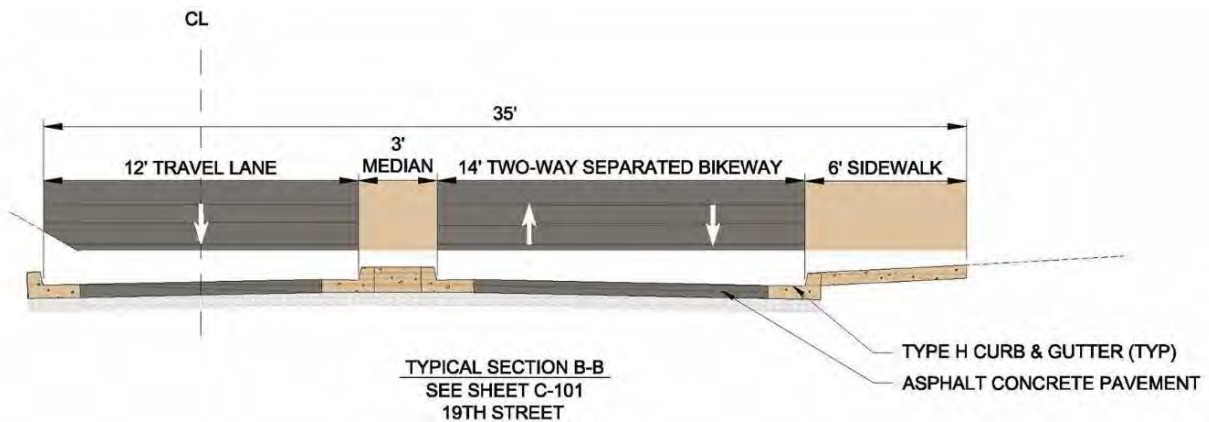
Typical Cross Section on 19th Street between B and C Streets
